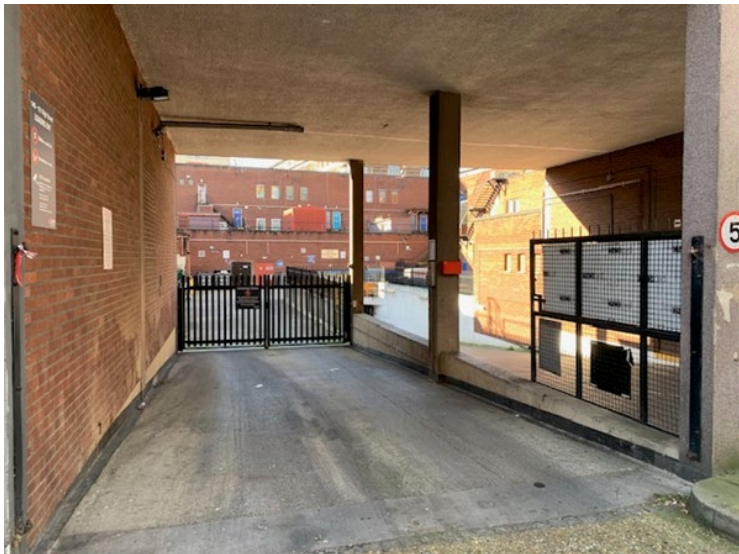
Entrances to the ground floor (left) and basement (right) car parks.
